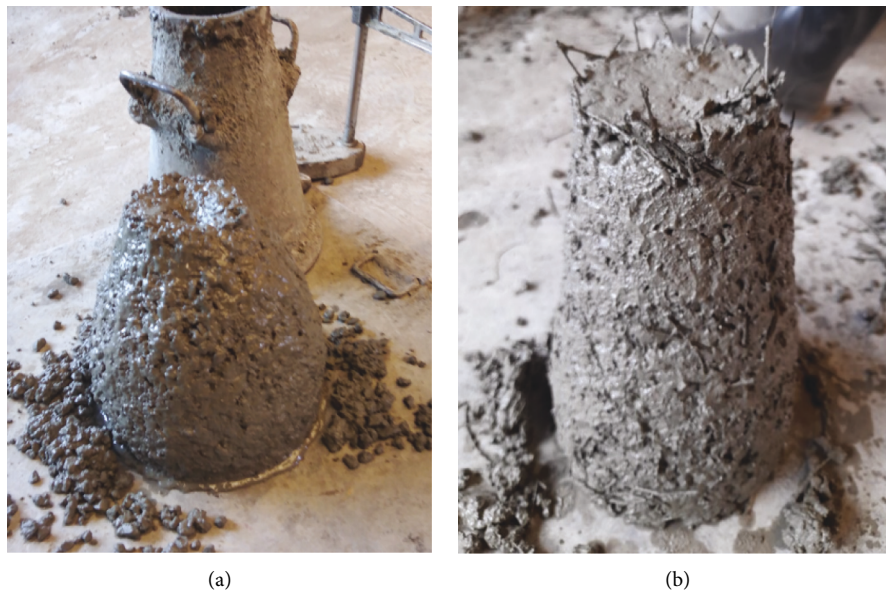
Concrete workability. (a) 90-mm slump for CM. (b) 20 mm slump for SFRC60-1.0.
